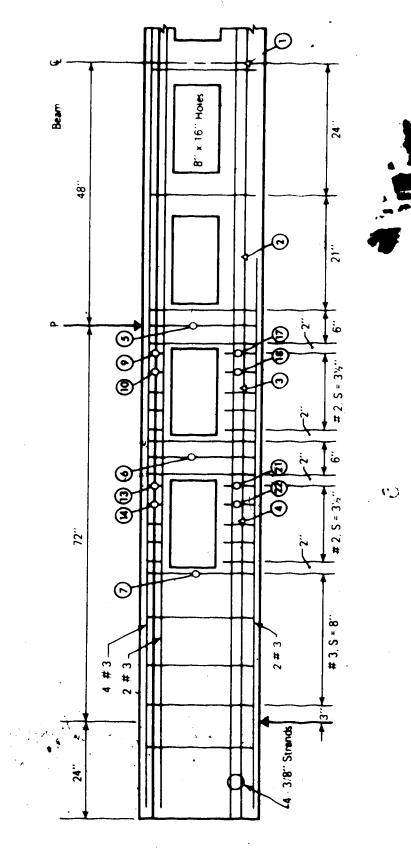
Reinforcement Details and Strain Gage Locations for Beam 1-16-6
